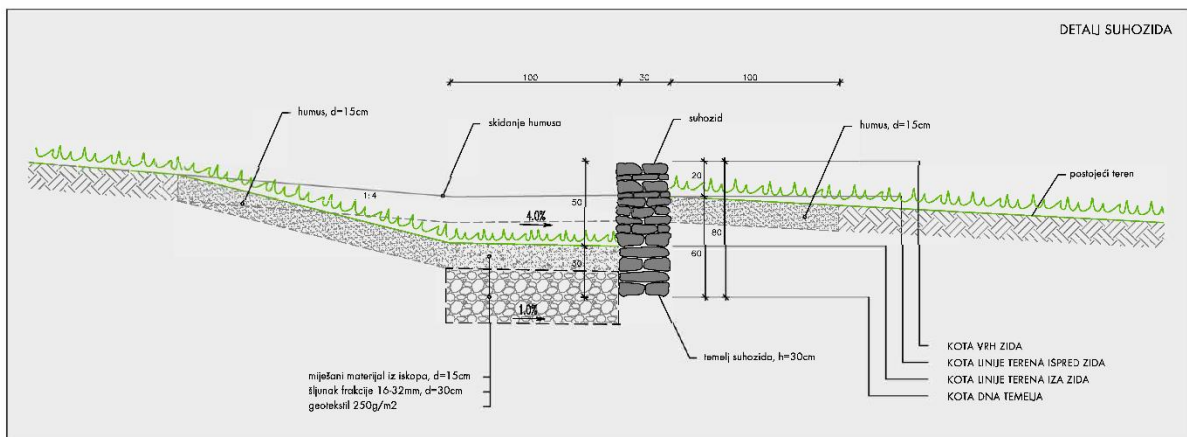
Dry stone wall renovation for the purpose of retaining surface rainwater (Starum) [13]
